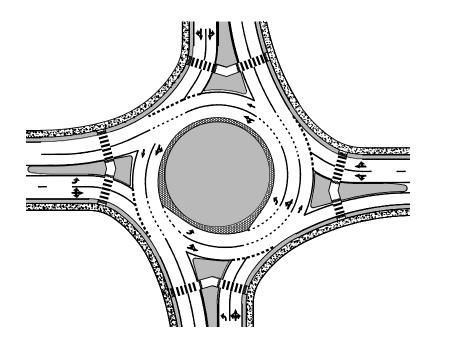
Multilane Major Street with Single Lane on Minor Street
